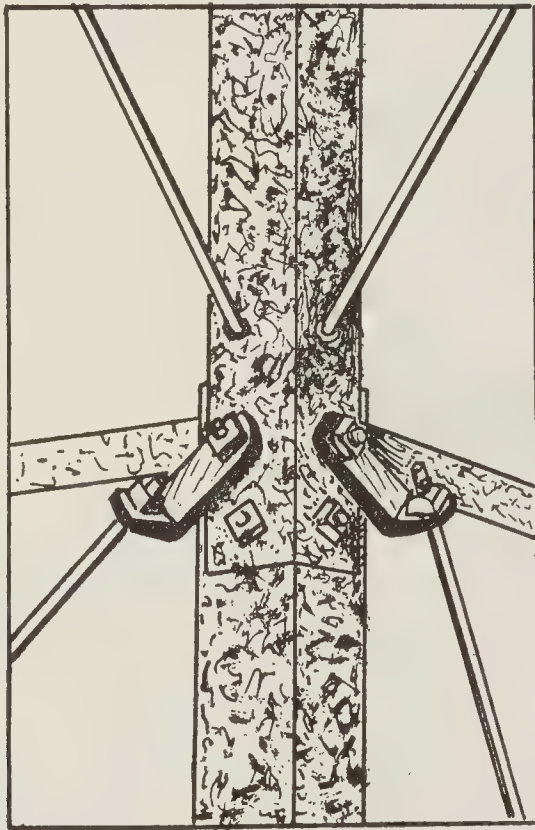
,824.—Butler steel tower construction 3. Outside of corner post of tower showing method of attaching brace rods and bands.
